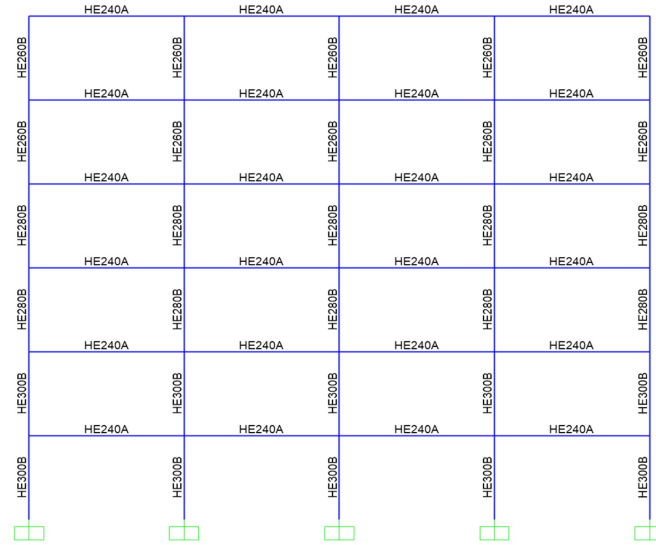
Six-storey four-span planar steel Moment Resisting Frame studied. Sections used for beams and columns
